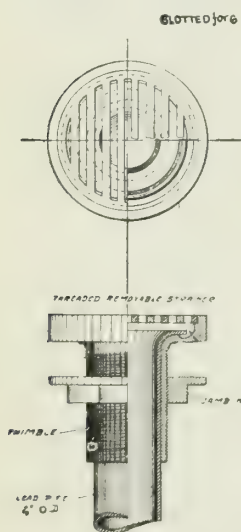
SCUM GUTTER OUTLET THIMBLE
